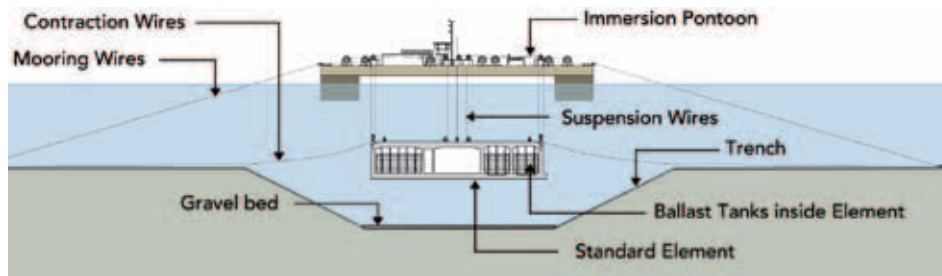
Lowering of an element from an immersion pontoon (cross-section through centre of element).
